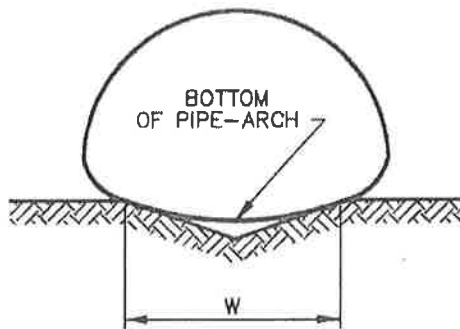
Shaped Bedding for Large Pipe-Arch, Horizontal Ellipse and Underpass Structures
